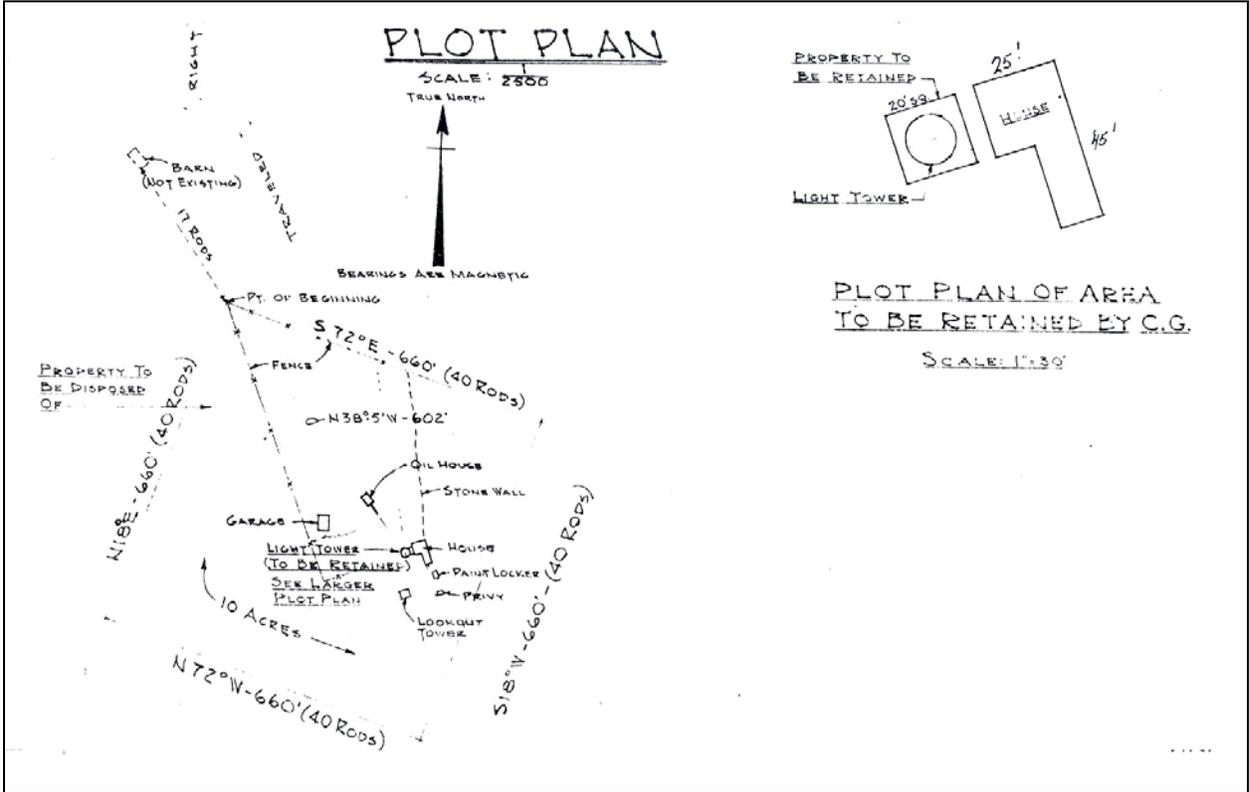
Detail of "Baker Island Light Sta., Maine, Sketch Plot Plan," Dec. 1, 1955.
